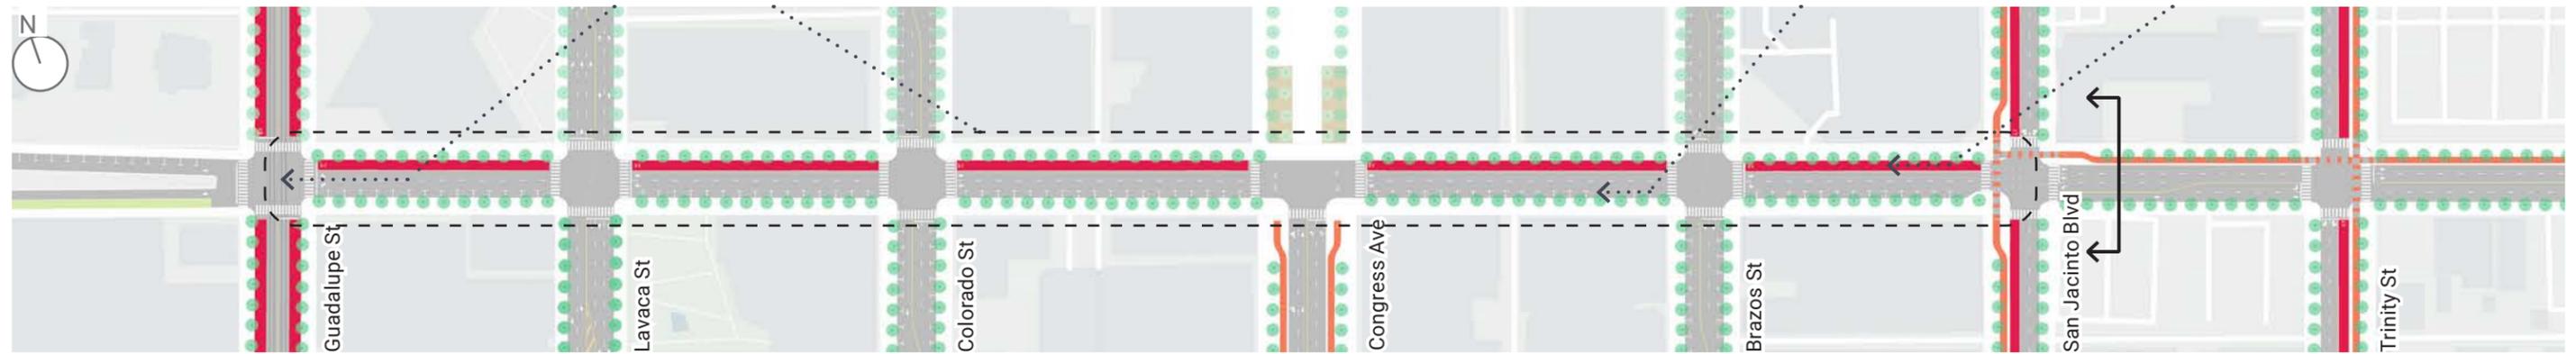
Seventh Street schematic San Jacinto Boulevard to Guadalupe Street
